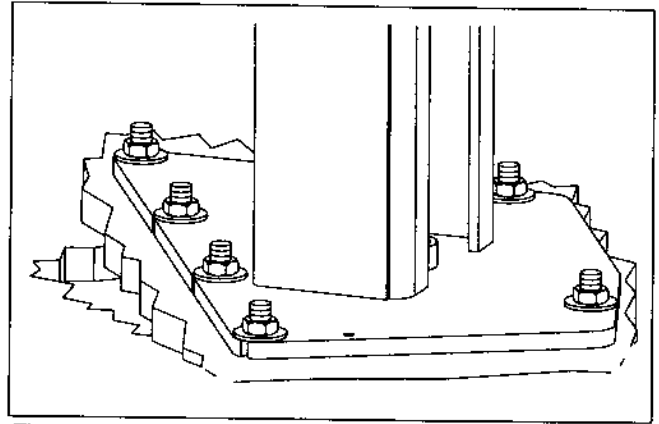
Unsuitable Installation Surface: Concrete specifications must be followed to insure safe installation and operation.
